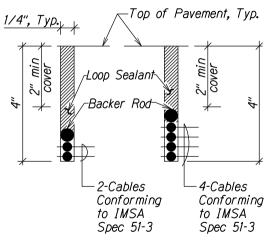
DETAIL OF SENSOR LOOP AT EDGE OF ROADWAY
